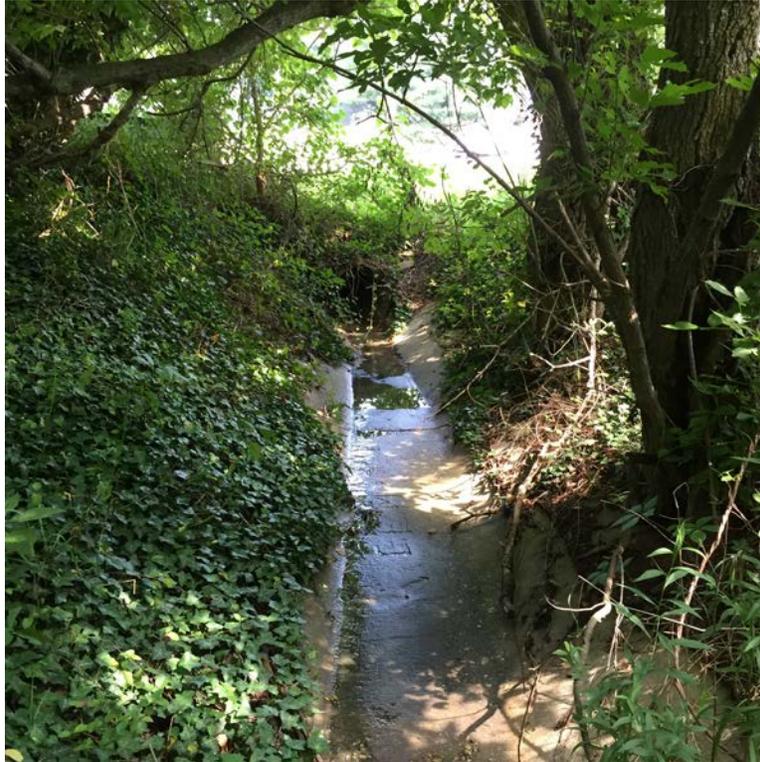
Looking southeast (downstream) at Spa Creek, located on the southwestern portion of the study area.
